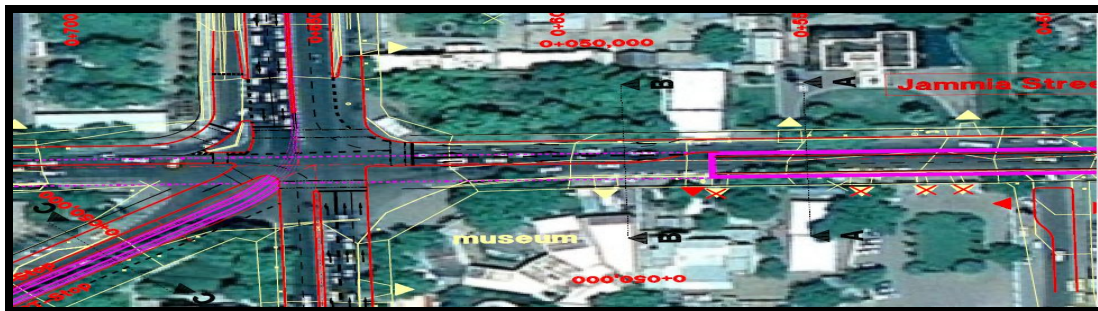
Jamaa / MckNimir Street Underpass Layout
